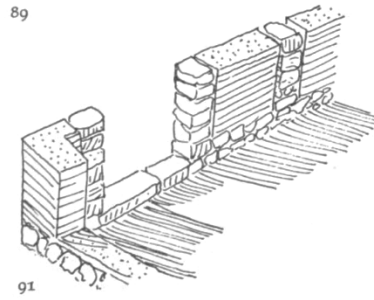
Kültepe/Kanesha, mudbrick wall supported with stone walling [17].
